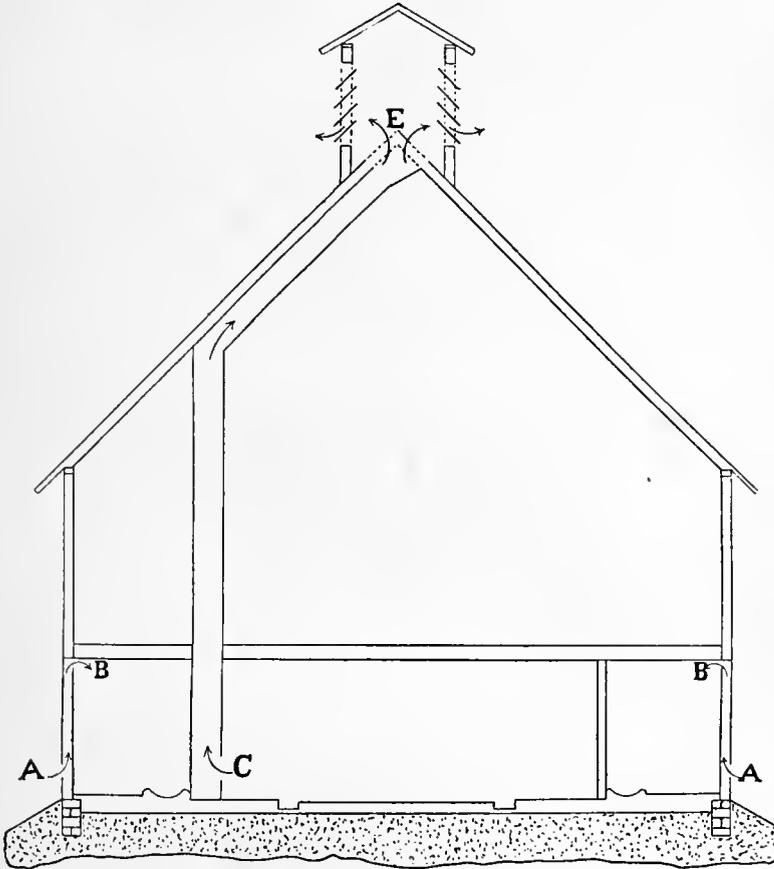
Ventilating a stable with a single outlet flue. The fresh-air intakes AB, are constructed about 10 or 12 feet apart between the siding and sheathing, or if of stone or brick, as shown in Figs. 10, 11 or 12. The ventilator flue, CE, takes up the place of only one cow, and fewer angles are necessary than where built up the side wall and around the plate and purline plate. A boxed hay chute with doors every five feet and an extension to the cupola may be used with very satisfactory results.
